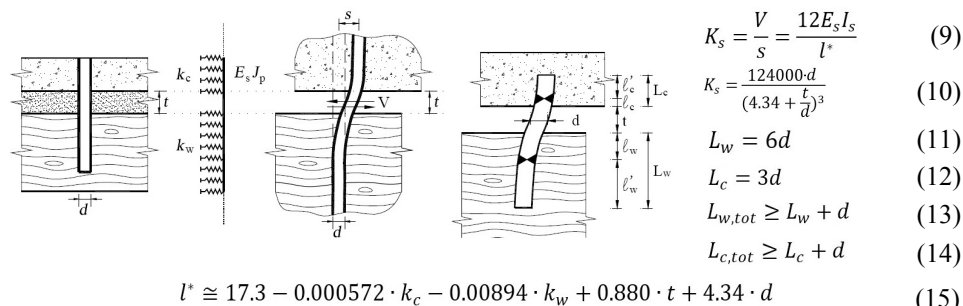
Stud connection modeling, K_s and stud lengths according Gelfi & alt [5]
